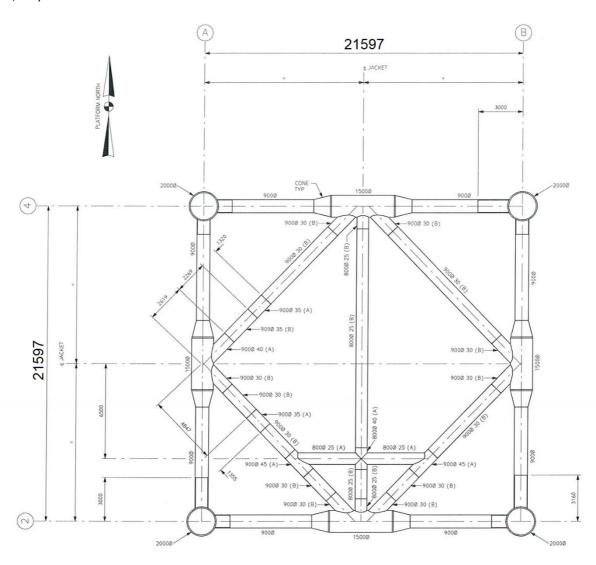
Solan jacket bracing plan at EL. +10.000
